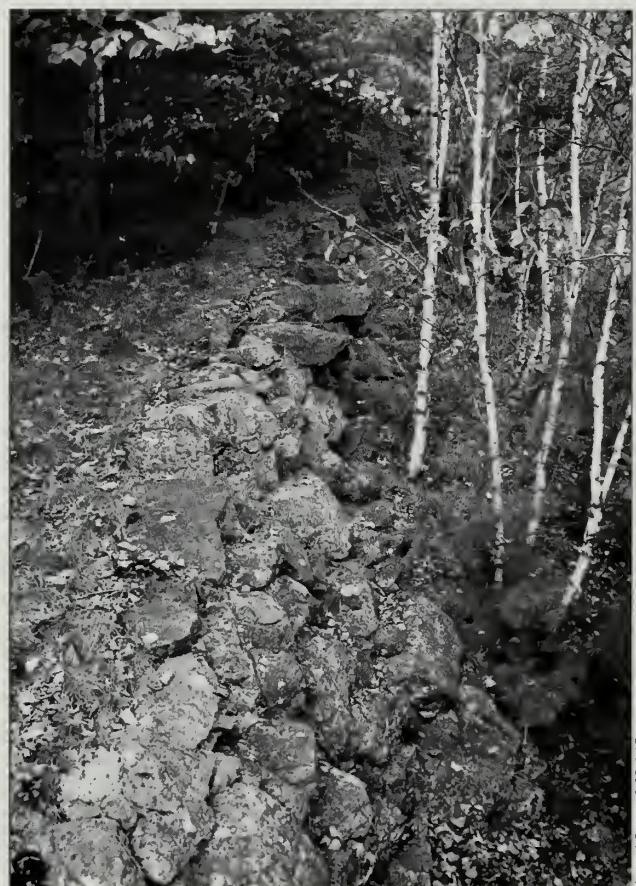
An original rubble-laid retaining wall on the abandoned Gurnee Path (#352).
